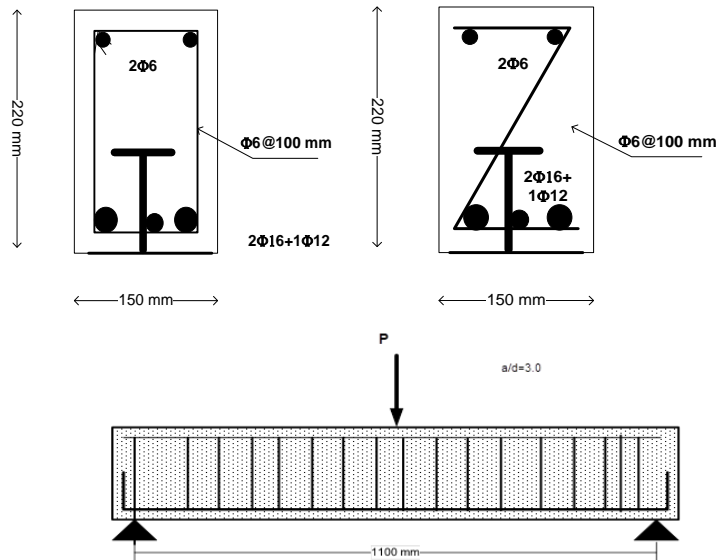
Longitudinal Sections and Cross Sections of Tested Beams
